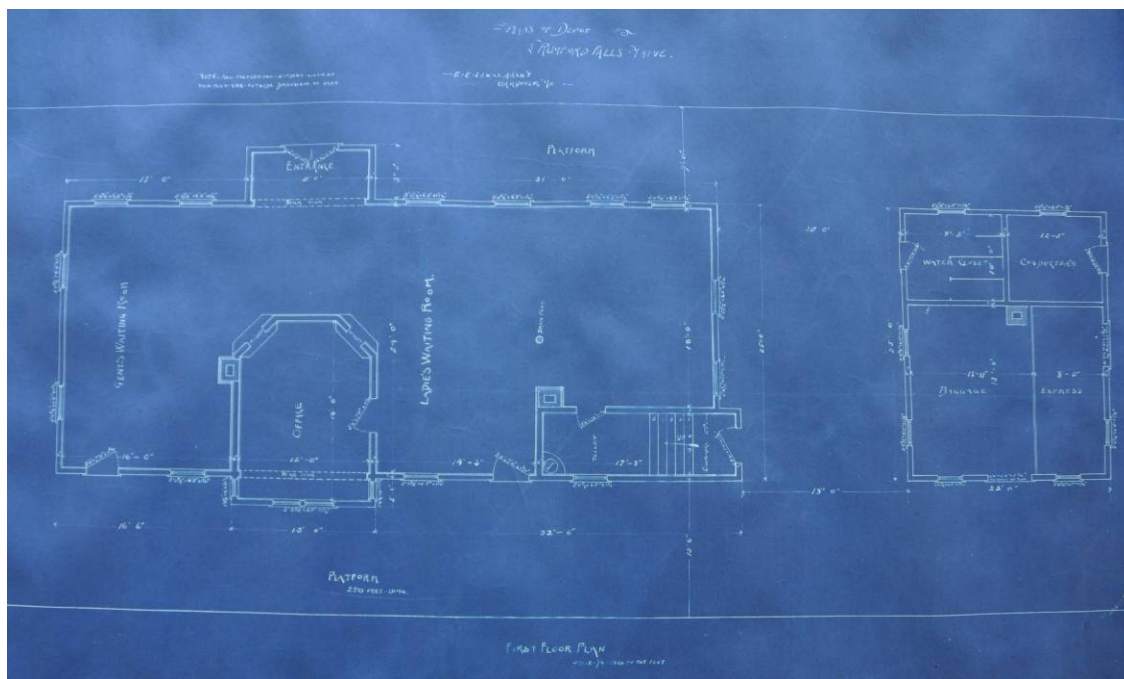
Rumford Falls Station first floor plan, April 1893. [Courtesy MHPC]
